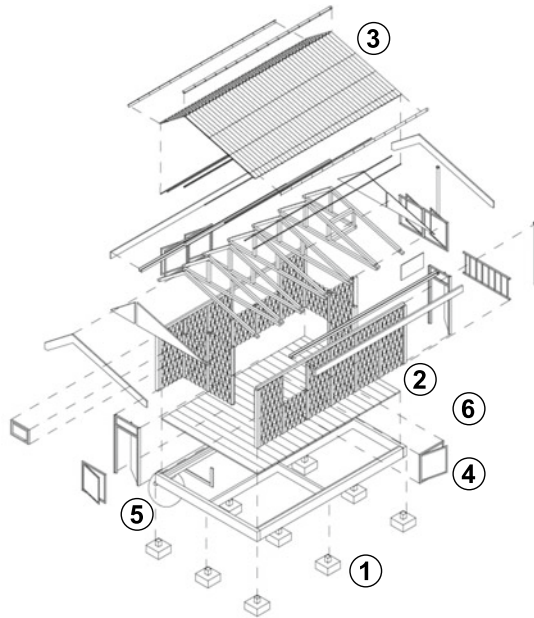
Details of components for fabricating a 3D printing small residential unit
